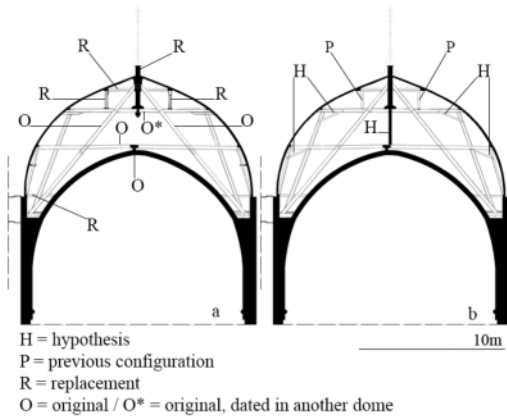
d02. Cross section: a) current state, b) hypothesis on the original layout (drawing: author).
